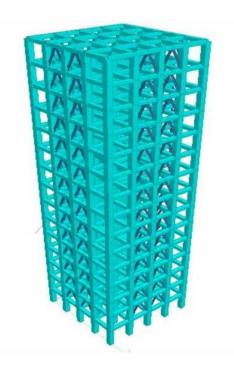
(a) Structural Plan for Inverted Vbraced RC Frame (Model-4)
